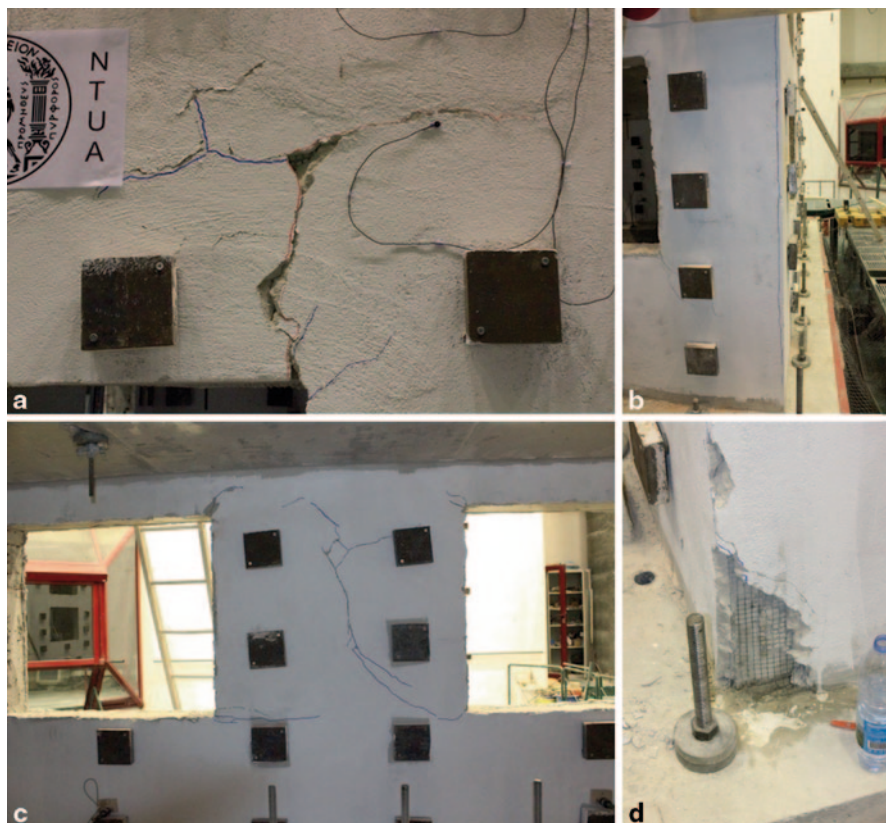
Damage after stage 3 a extensive cracking at the corner of the ground floor window of the North façade, b cracking in the coating along the height of the Northwest corner, c cracks at the West façade window jambs of the ground floor, d coating detachment at the base of the Southwest corner
